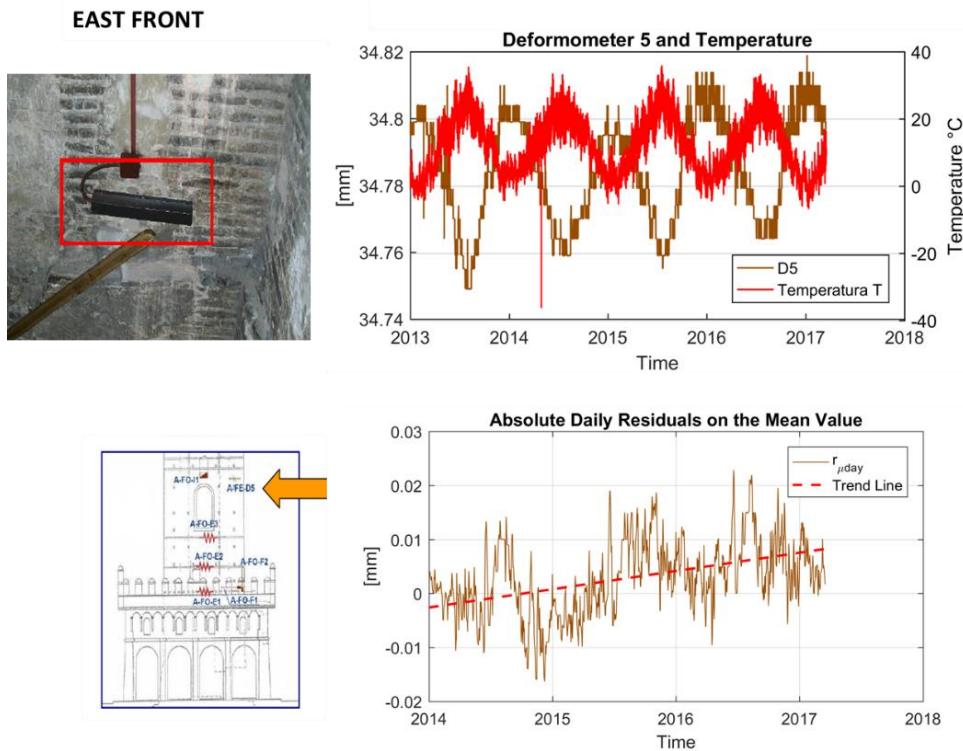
Deformeters D5 installed on crack located in the East front of the tower
